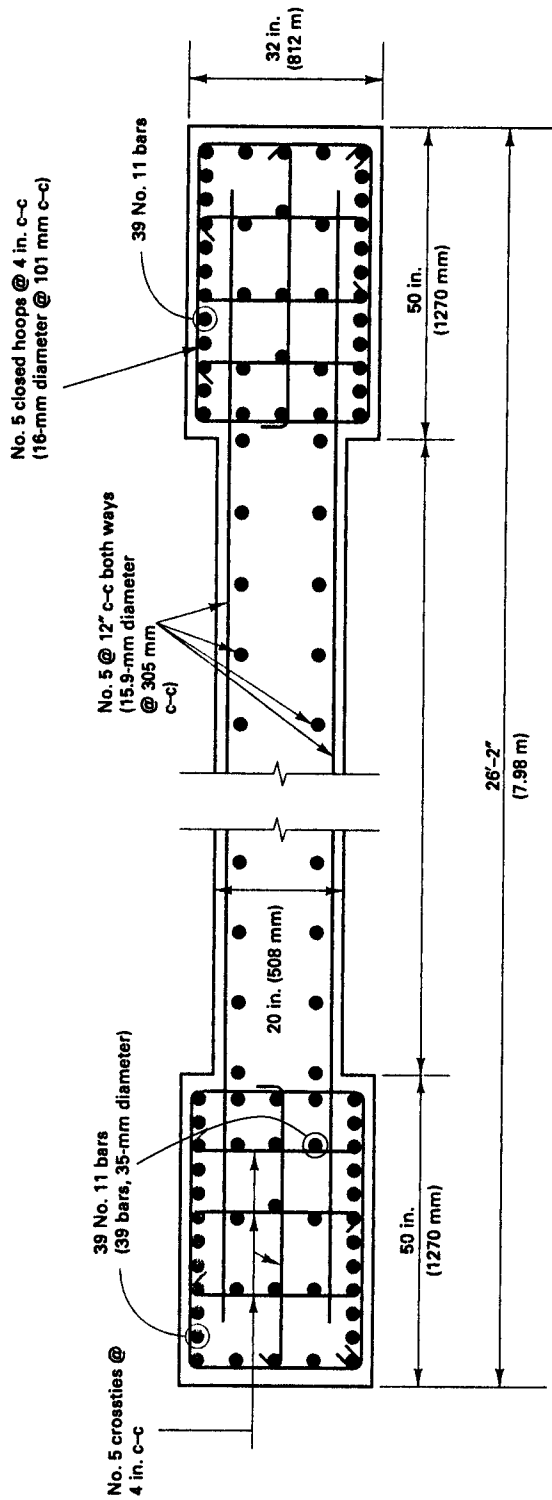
Plan and detailing of shear wall in Example 13.2.
